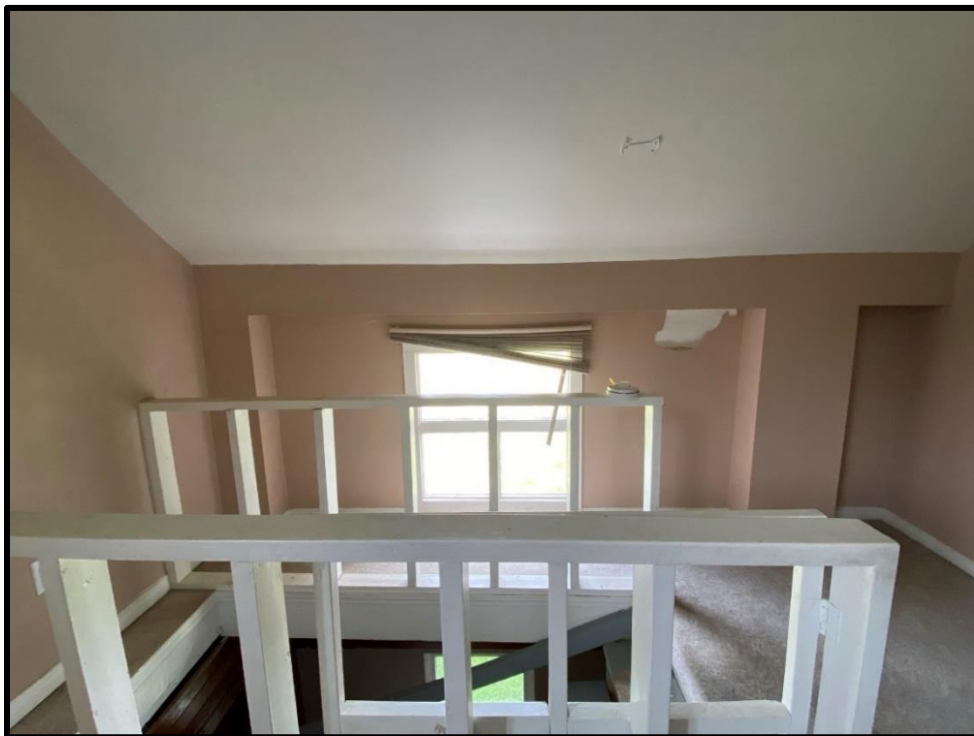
View of Drywall Bump Outs Showing Intersection of Posts and Connecting Tie Timbers
